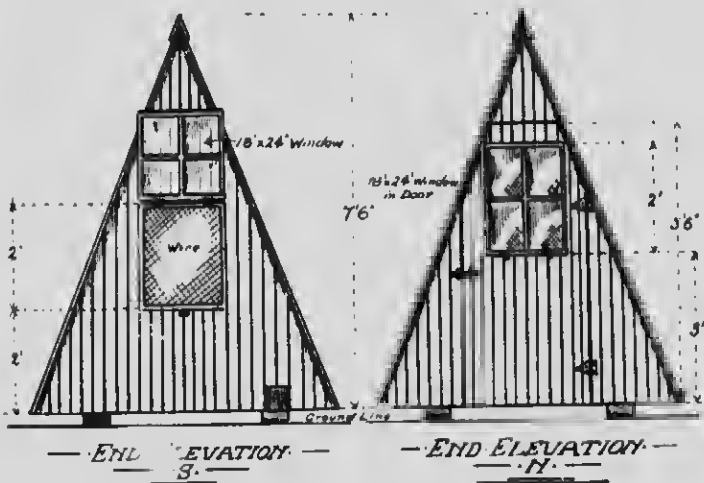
Showing construction of colony house. It is not advisable to use this house as a brooder house.
